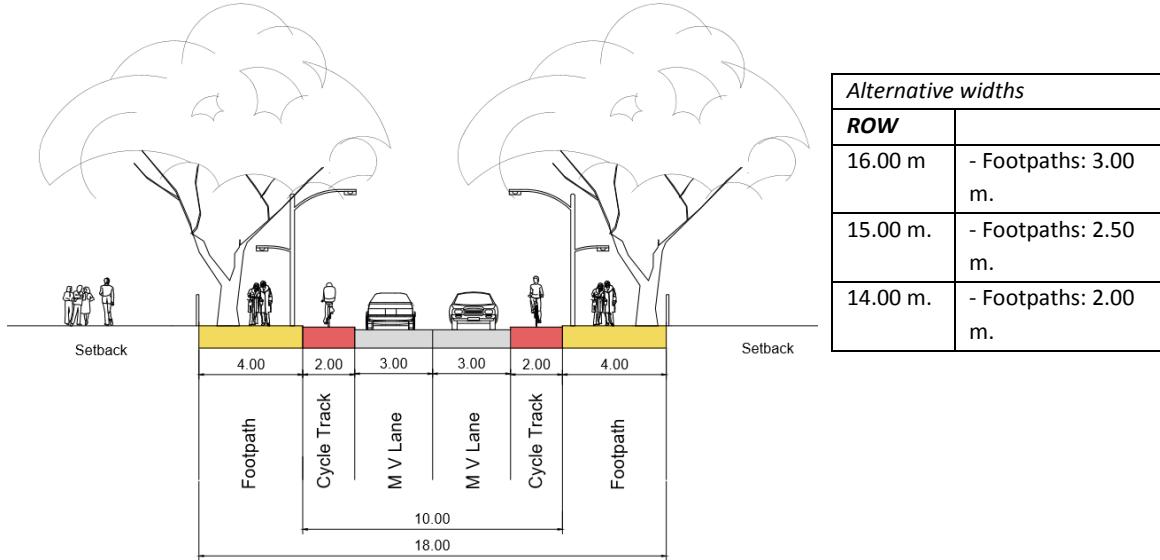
Collector road with raised adjacent cycle tracks, without parking
